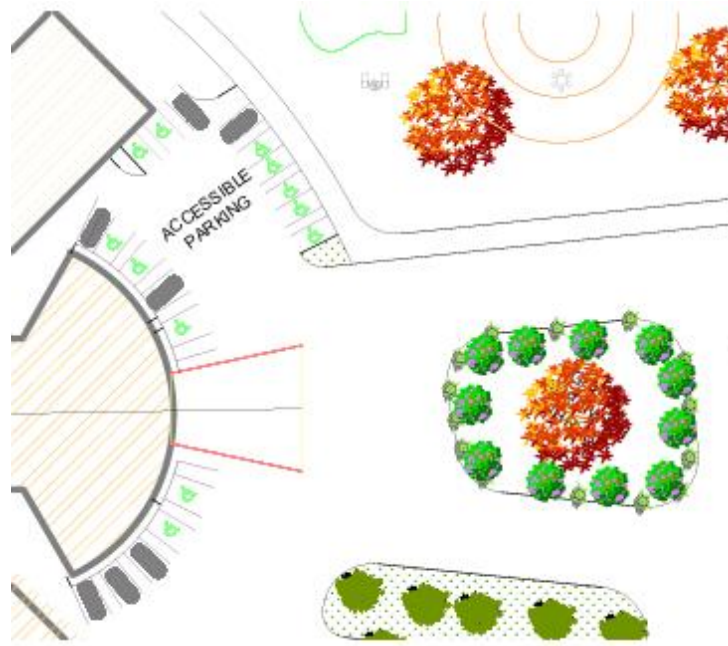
Part of Site Plan Showing Handicap Parking Spaces.
